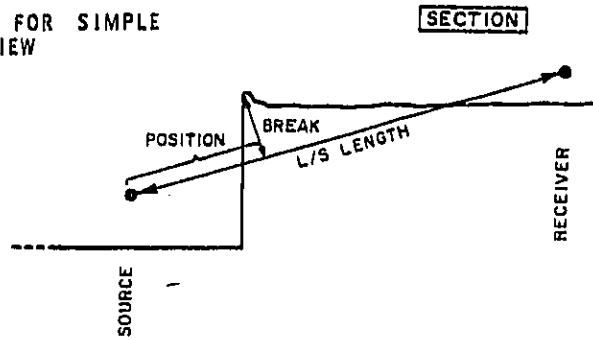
BARRIER PARAMETERS FOR DEPRESSED ROADWAY, SECTION VIEW
